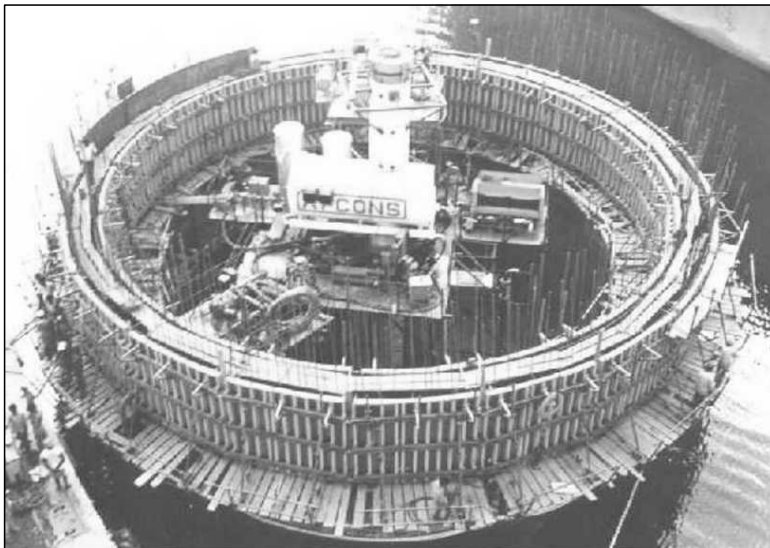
L&T- Wall Formwork with Climbing System in Use for Casting 20 m High Caisson Wall of 18 m Diameter (Contractor: AFCONS).
